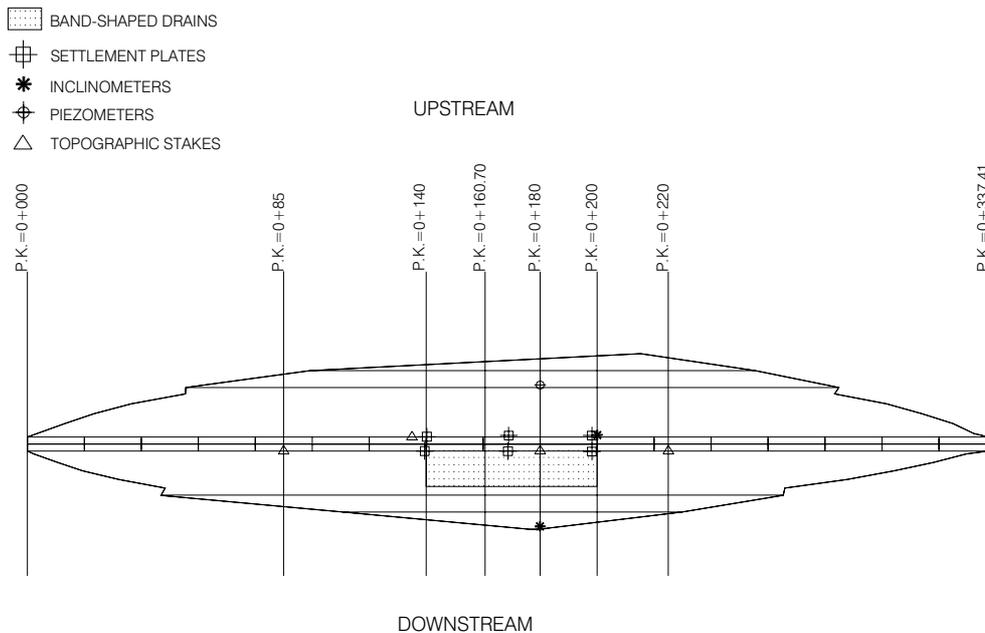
Plan showing the instrumentation in Dike No. 3.
